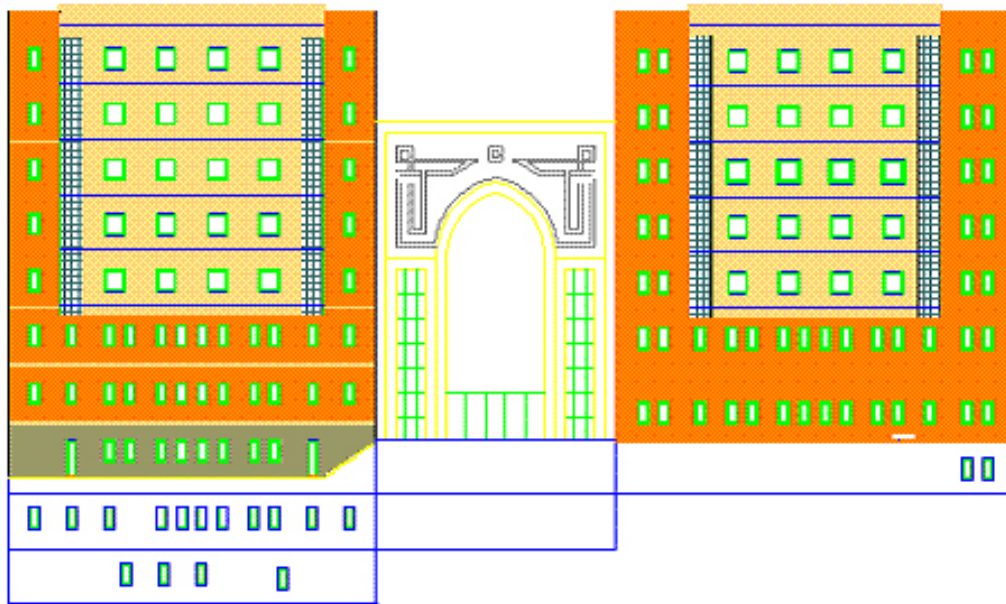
a: Architecture Engineering Building Main Entrance Elevation [36]
